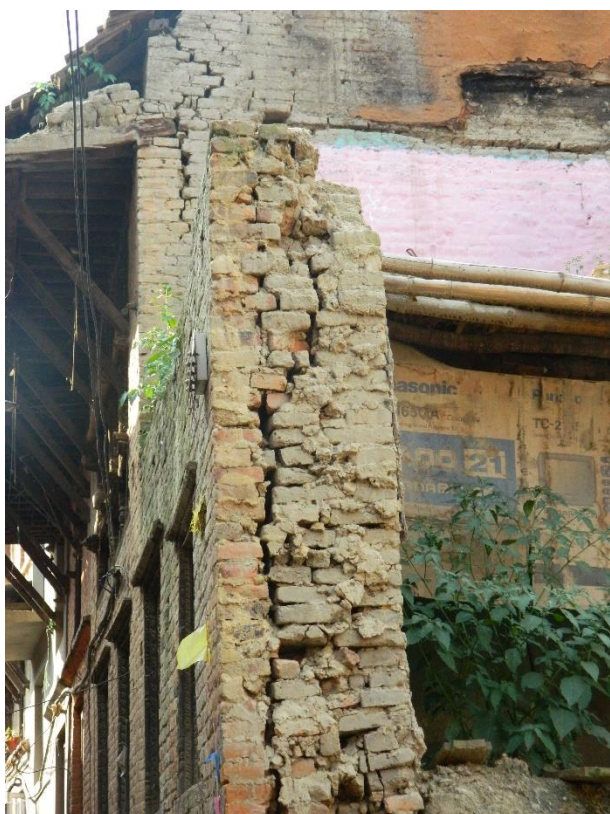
Low strength brick masonry, inner and outer wall (Shock Safe Nepal group 1).
